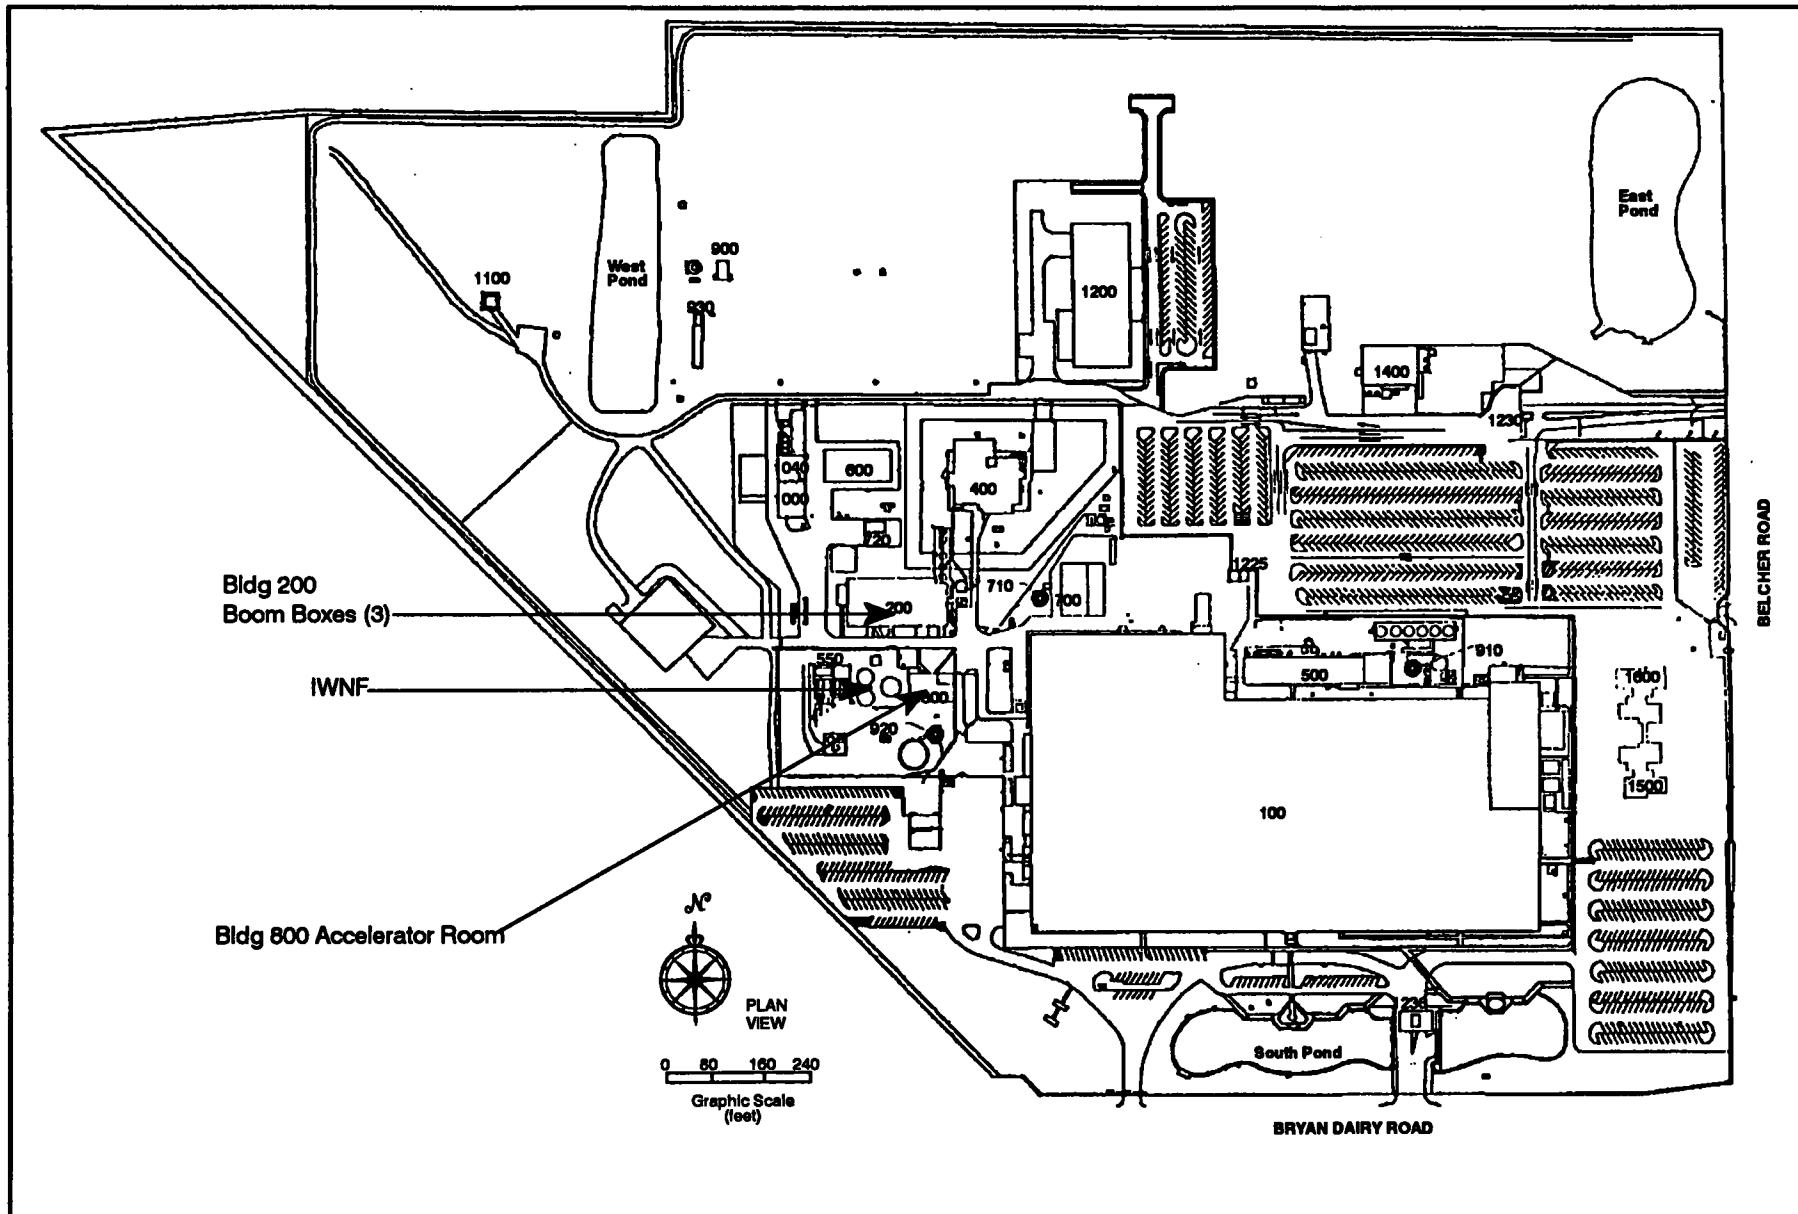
Pinellas Plant RMMA - Site As-Built
